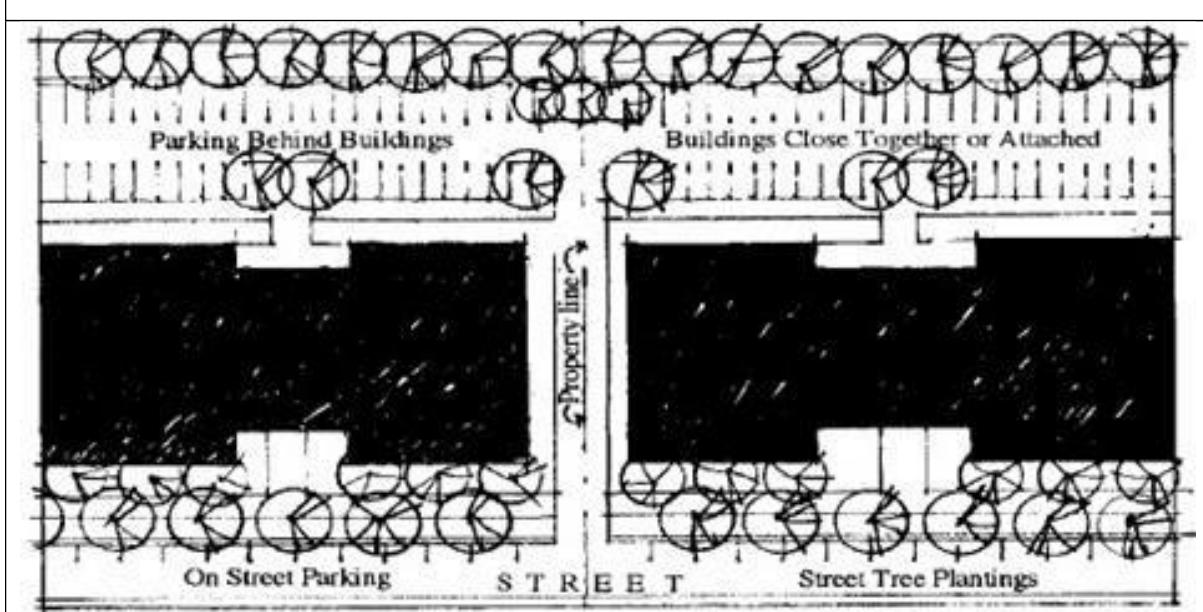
Desirable Scenario. Buildings closer together, parking well-screened and behind buildings, on-street parking, significant street tree plantings, greenspace buffer between sidewalk and road.
